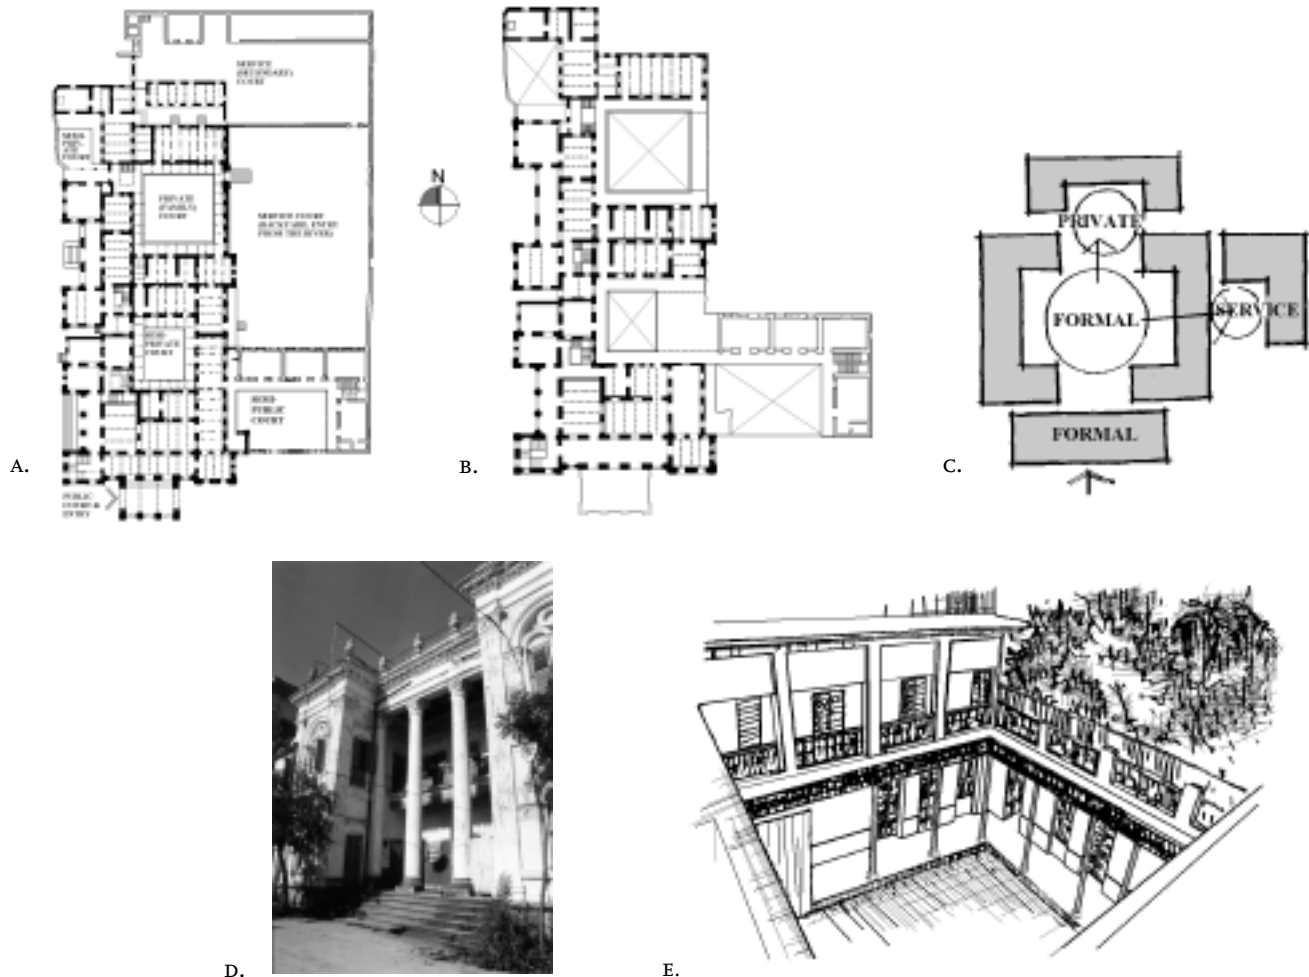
A) ground floor plan. B) second floor plan. C) articulation of zones. D) photo of west main facade. E) View of main internal family court.
